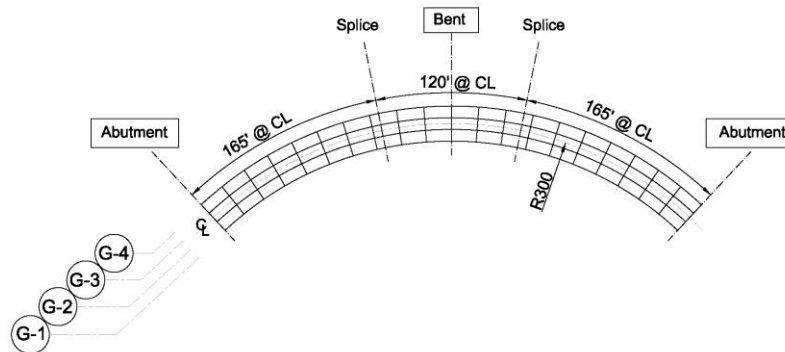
Simplified Framing Plan, Bridge C3: Two-Span, 4-Girder, 91.4 m Radius, R/L=13.3
